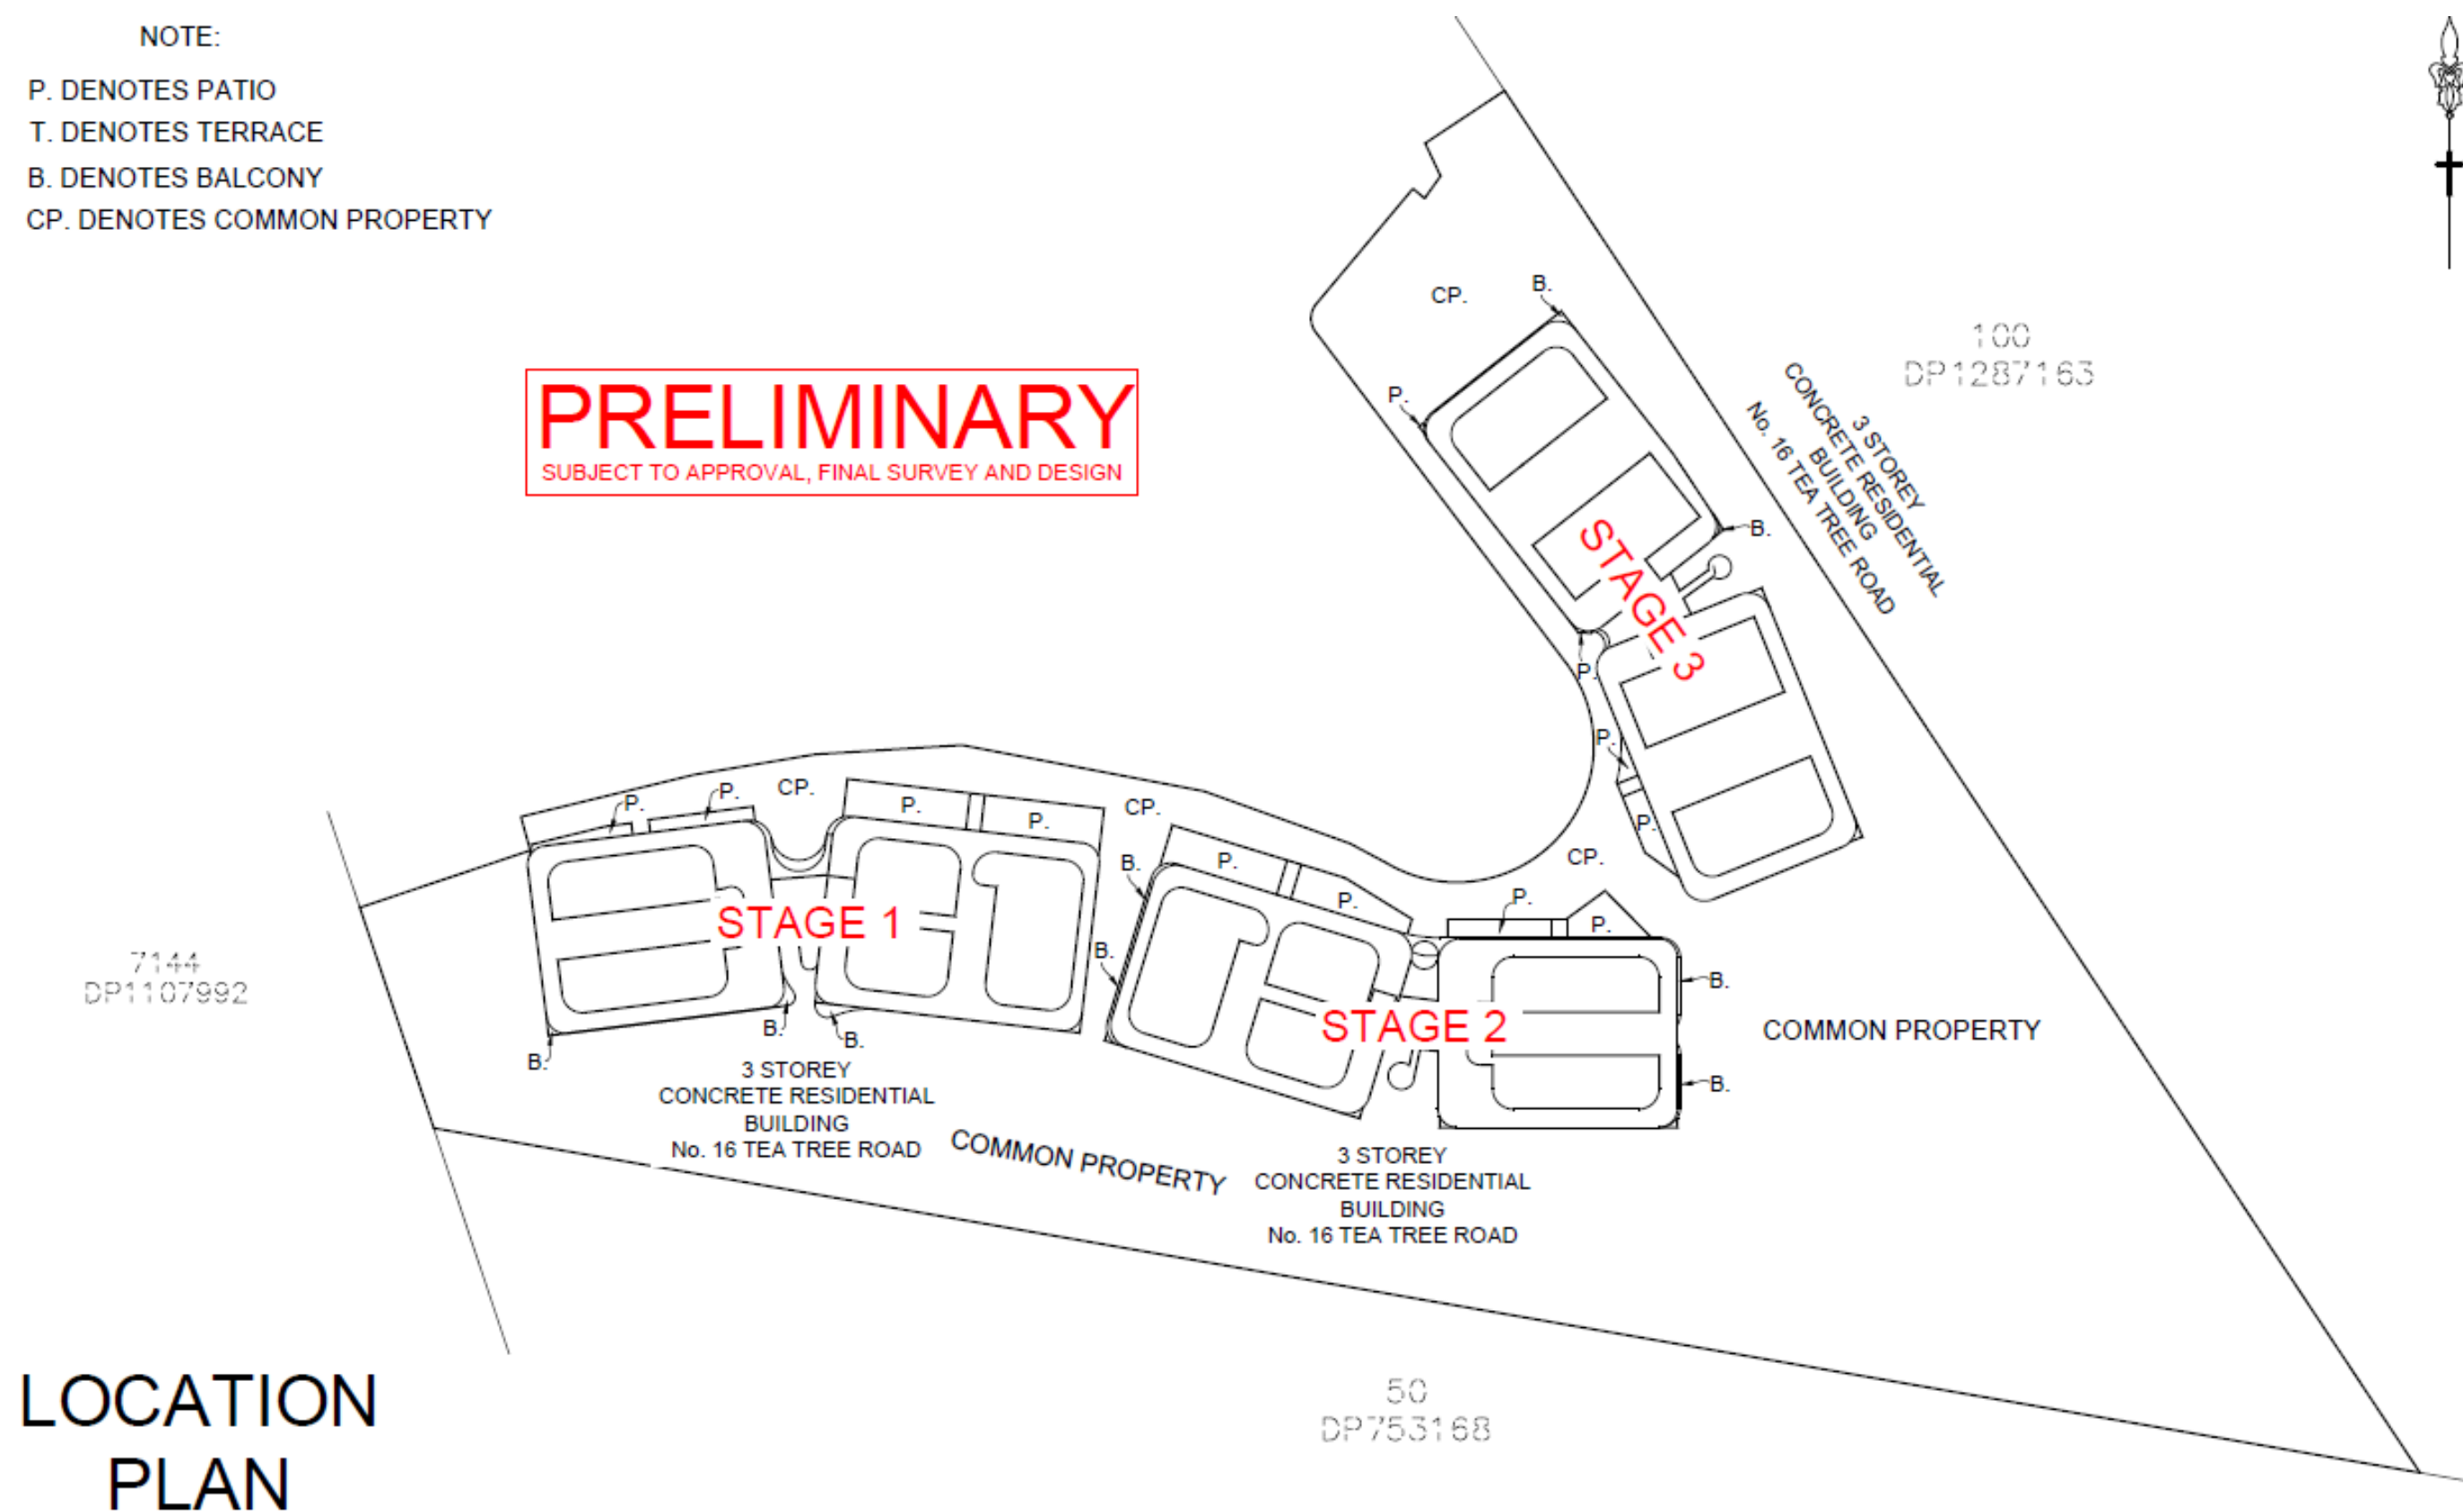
Extract of proposed plan of Strata subdivision and approved apartment buildings (Source: LSW Surveyors).
